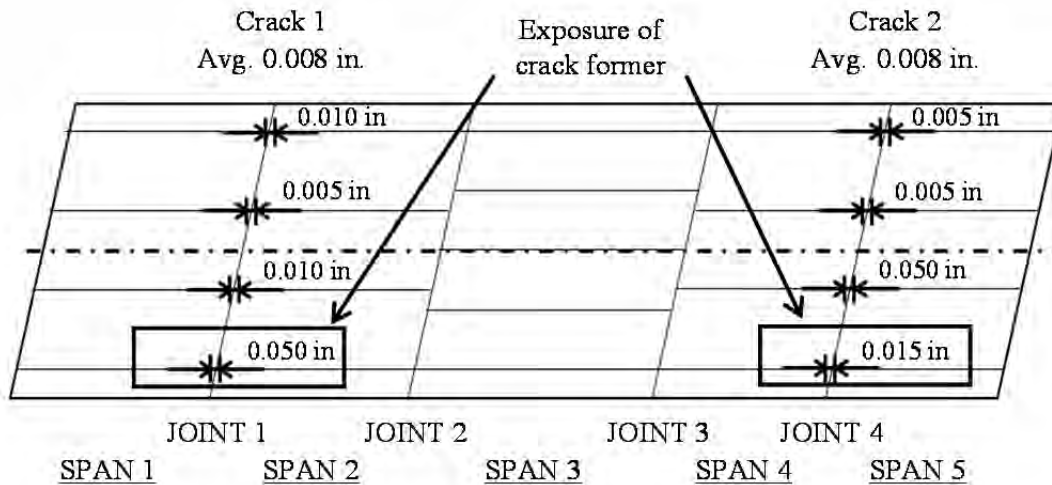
Result of cracking inspection of Lampasas River Bridge
